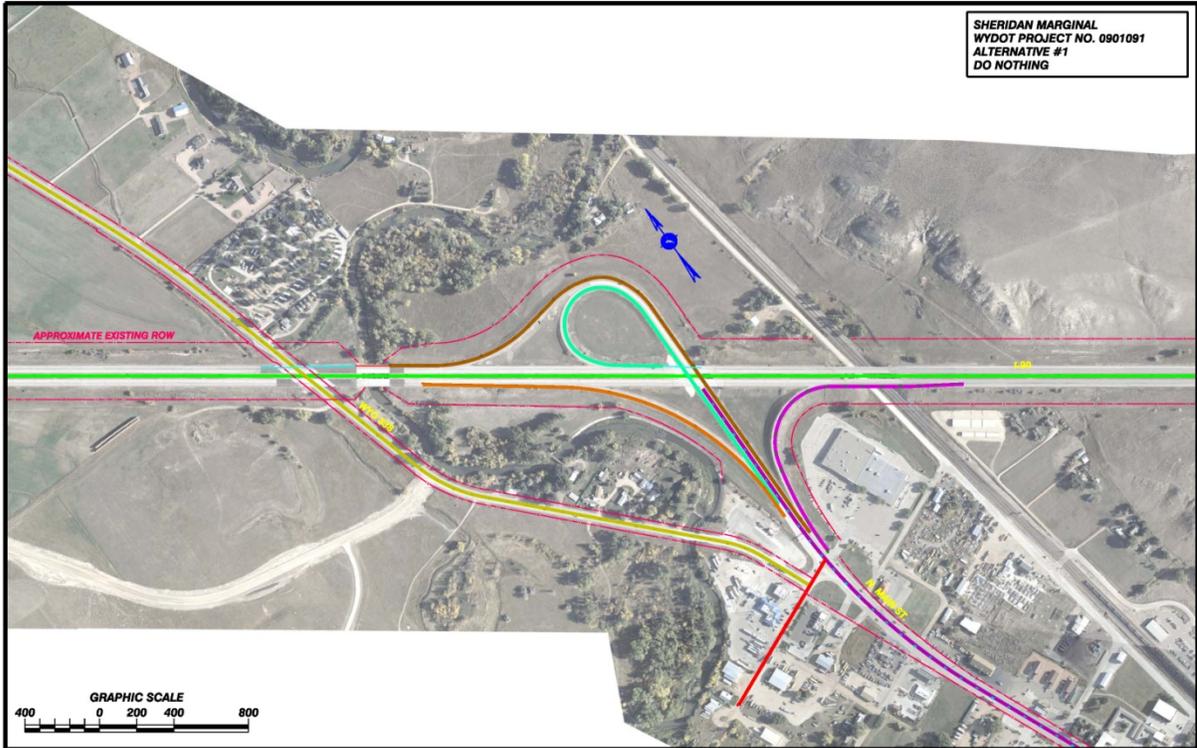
Alternative 1: No-Build. This alternative would not improve the existing geometric deficiencies, regional connectivity shortcomings, or deteriorating roadway segments.
